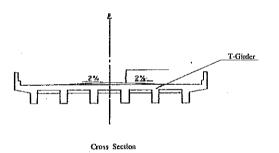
TYPICAL CROSS SECTIONS OF JETTY AT SG. PINANG MOUTH
